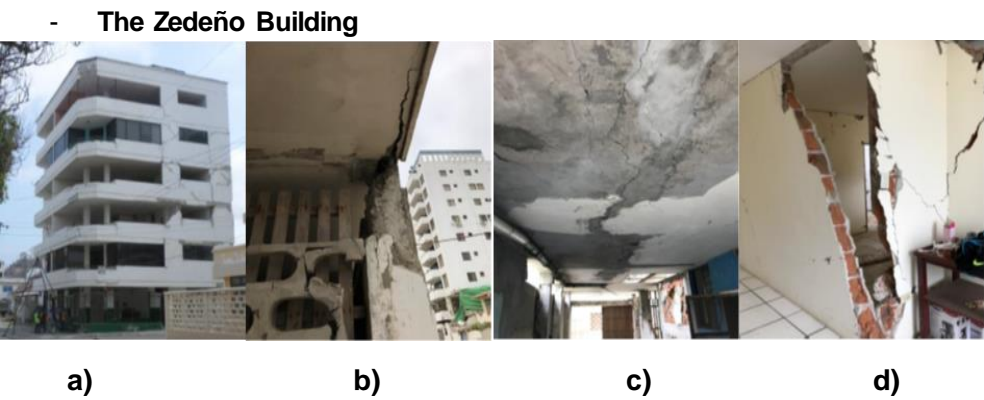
The Building Zedeño; (a) After The earthquake; (b) Damage in columns; (c) Crackings in panel of slab; (d) Collapse in masonry.
